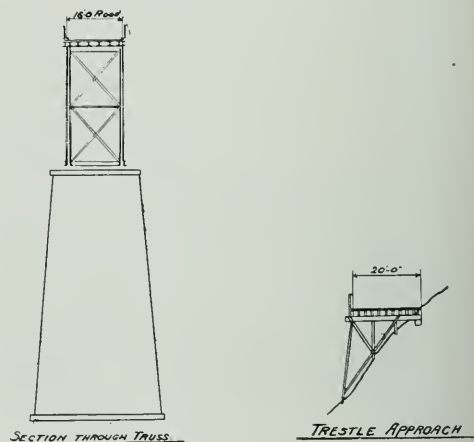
Sections of Abutment and Trestle of New Bridge.
